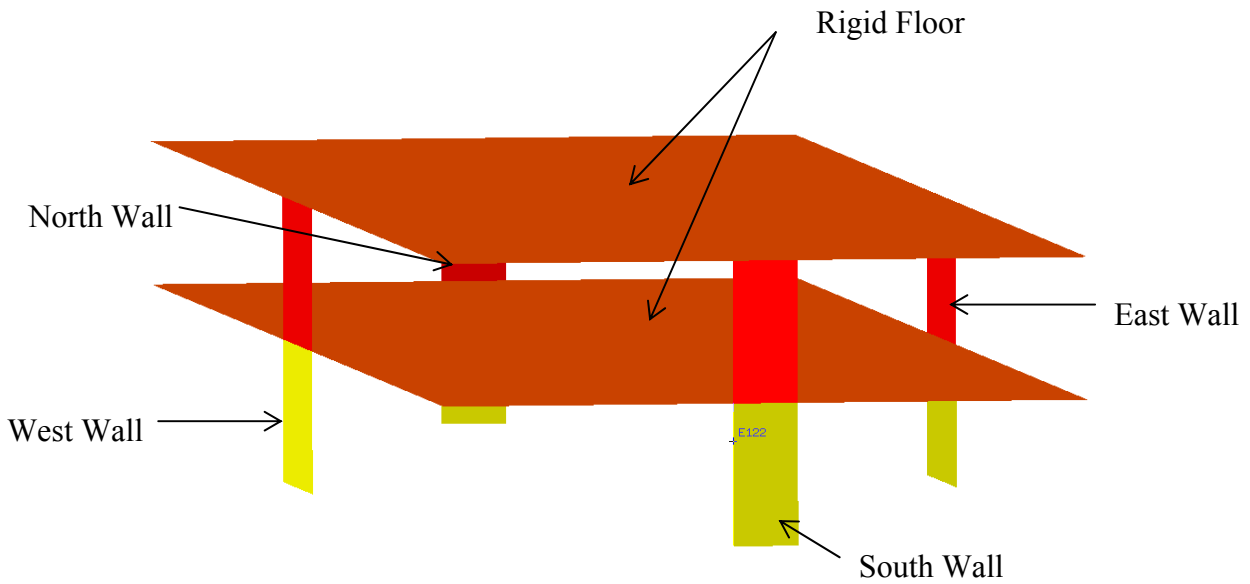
Finite element model for un-reinforced masonry commercial/residential building, all walls are modeled by the ABAQUS user-defined-element.
